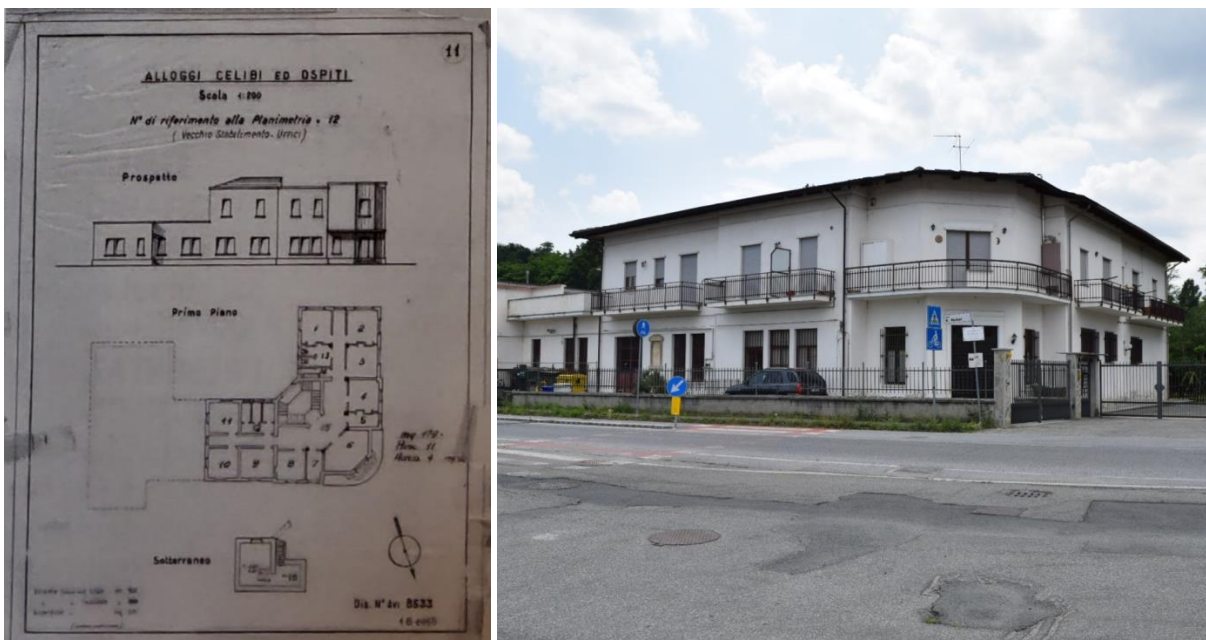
Technical drawings³⁰⁴ and current view of the Guest House.
